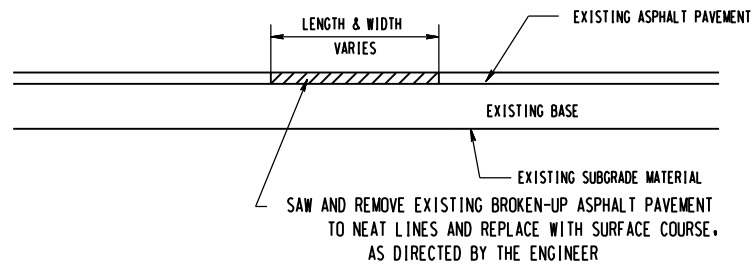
DETAILS OF REPAIRING EXISTING PAVEMENT PRIOR TO RESURFACING FOR FULL DEPTH AND MILLING
